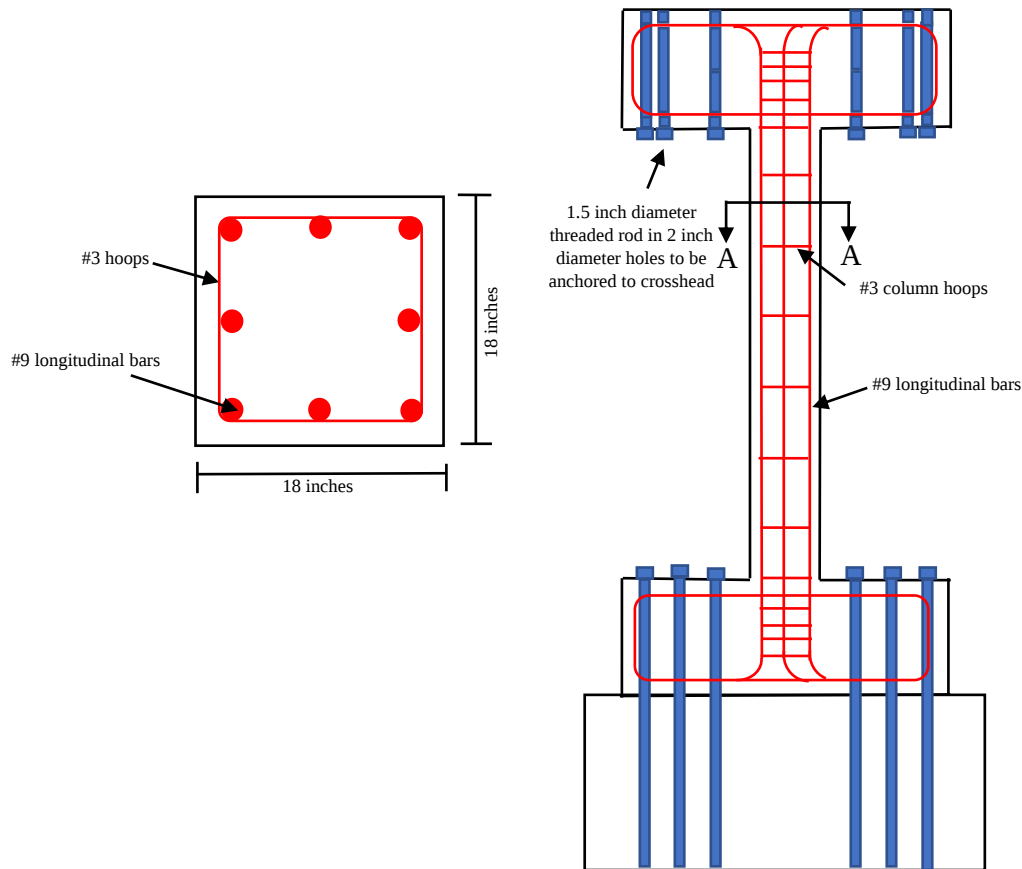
Typical Column Specimen and Testing Configuration (Modified from Matchulat 2009)
